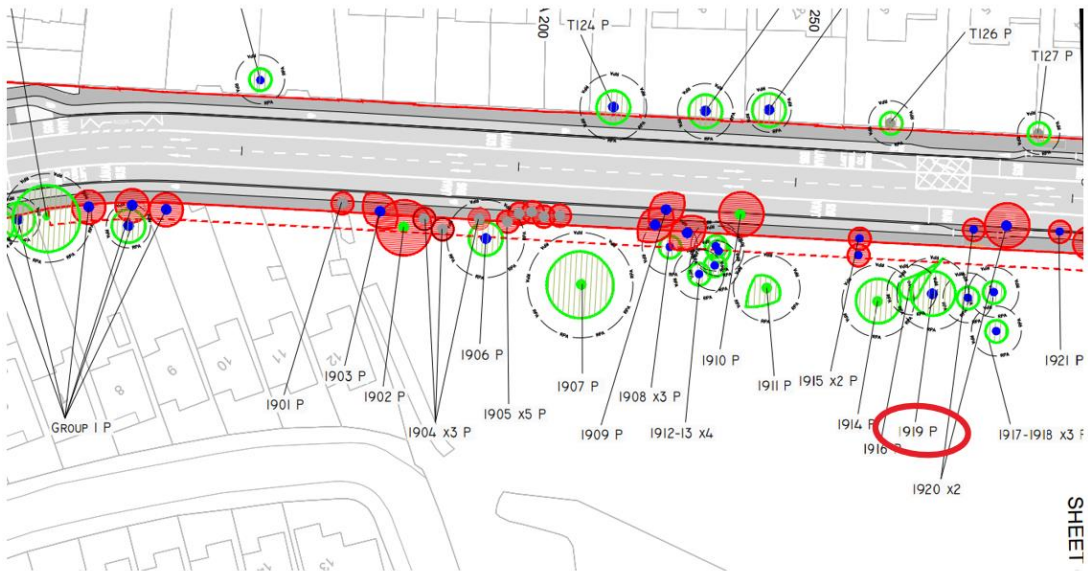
Extract from Tree Protection Plan showing location of Tree 1919
